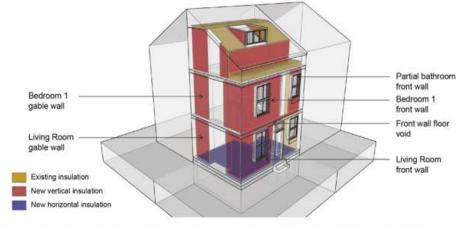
Stage 4: IWI retrofit to ground and first floor external walls (17BG.A.R.E.W)
